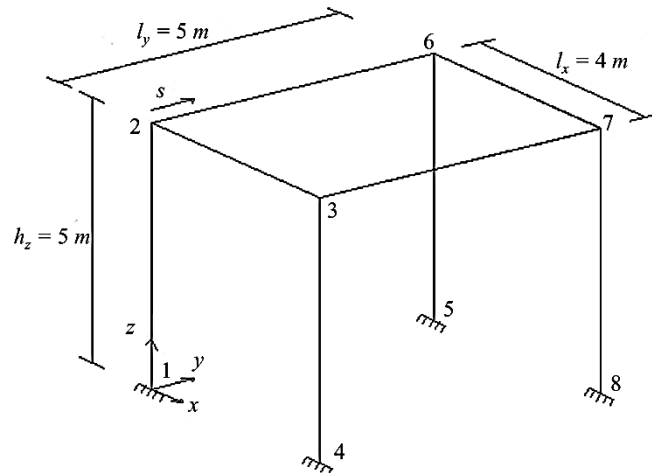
Spatial frame with beams and columns and global coordinate system.
